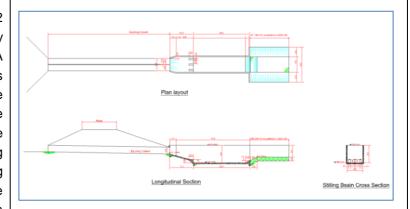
Details of proposed stilling basin at site 2 (downstream of the Barry Hertzog Avenue culvert)
